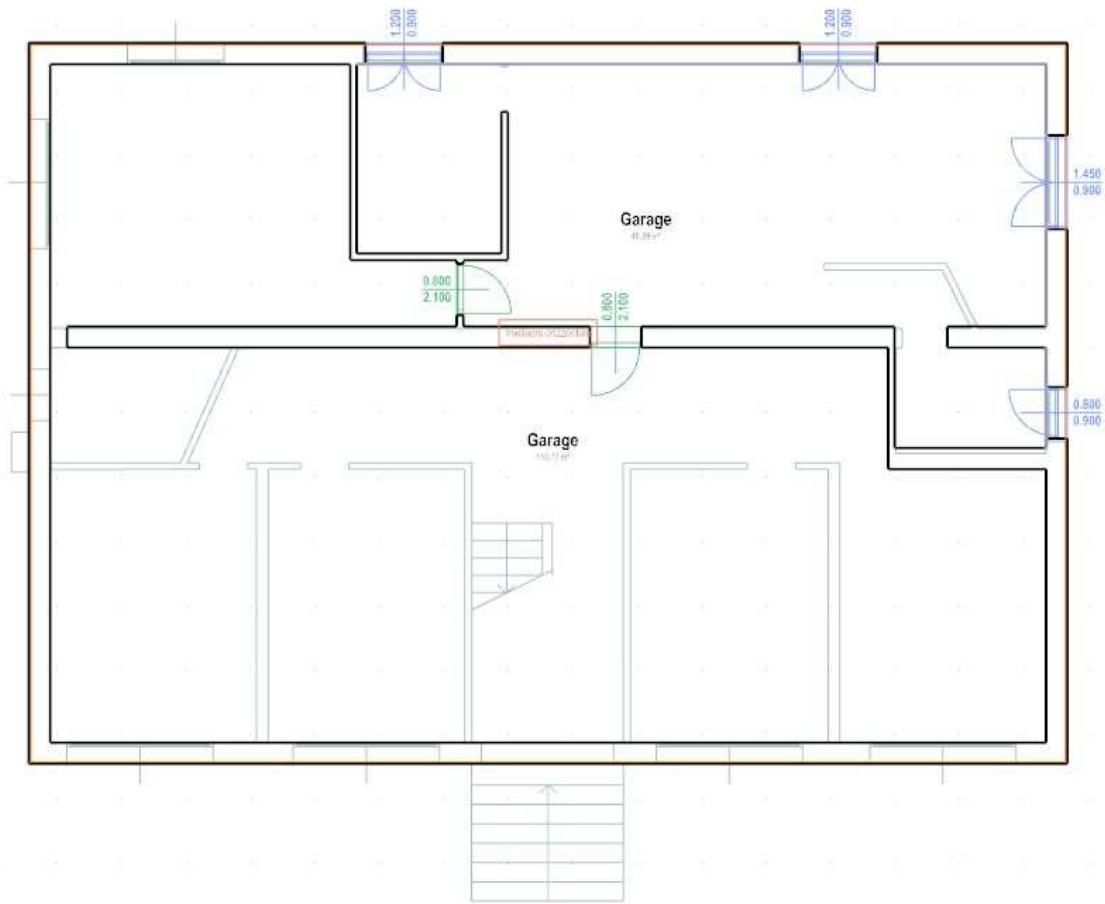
Ground Floor Plan of the Modelled Residential Building
